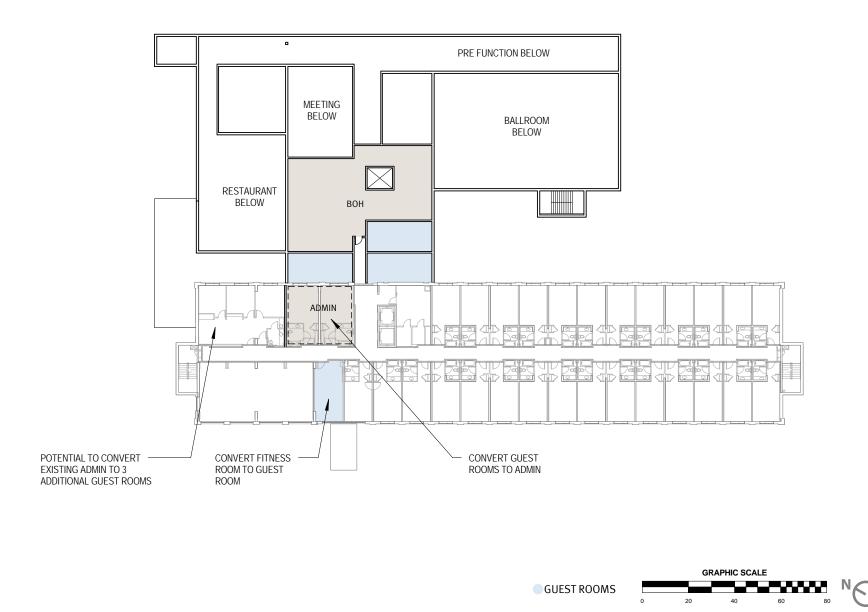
Second Floor Plan Source: Arrowstreet, 2014
